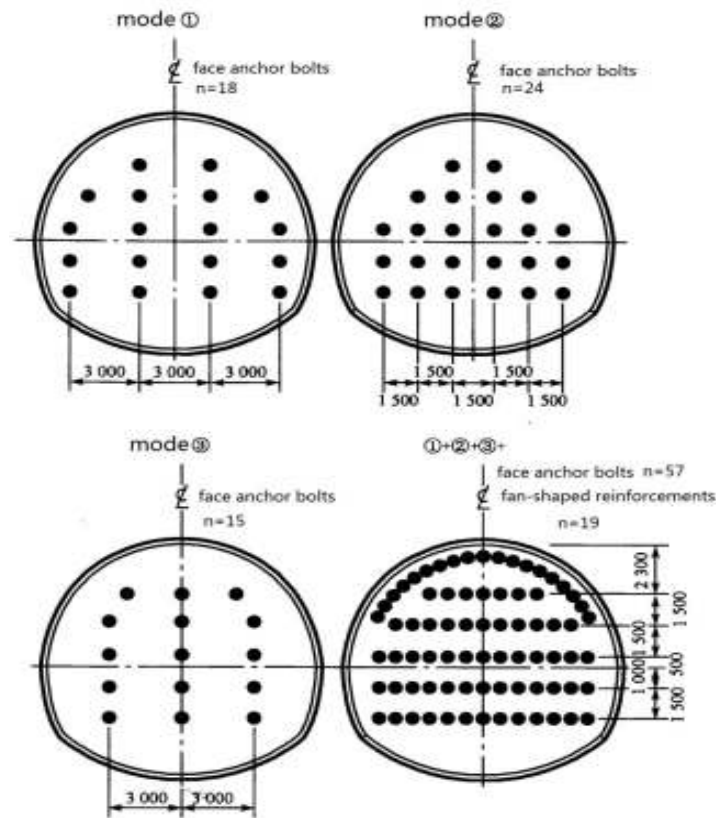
The reinforcing long bolt method in Iiyama tunnel
